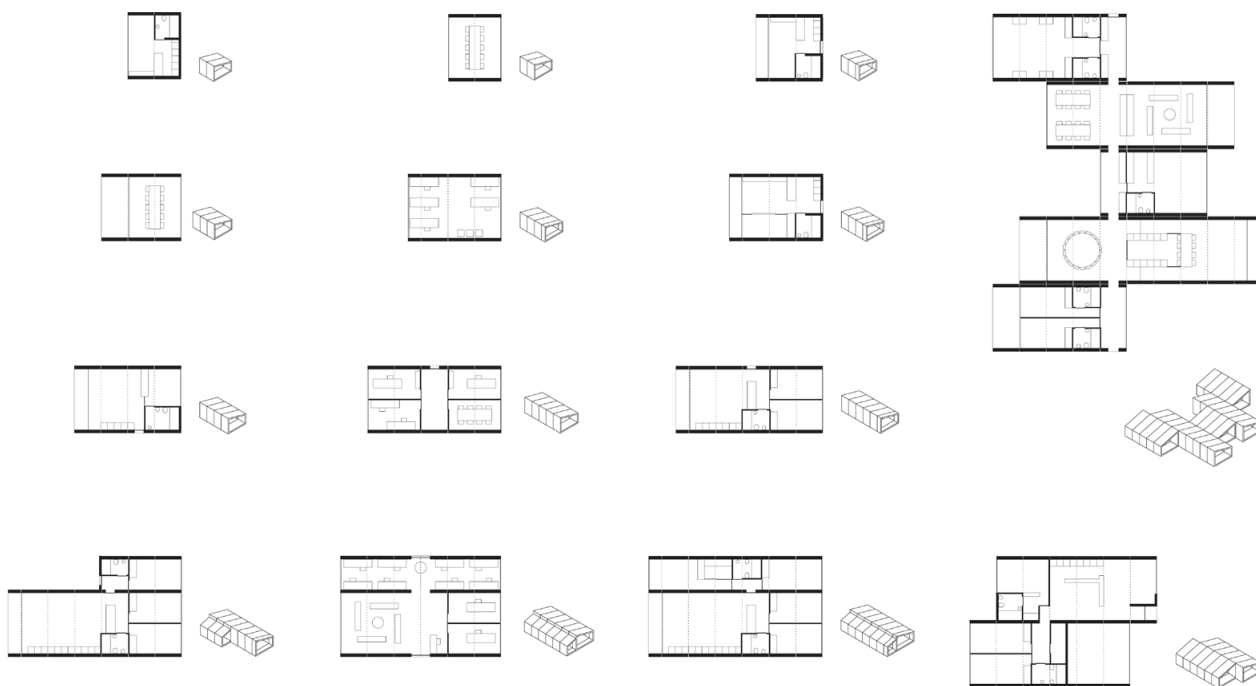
| Installation of Infrastructure - Structure - Architecture, assemblage of modules, credits: SUMMARY.
